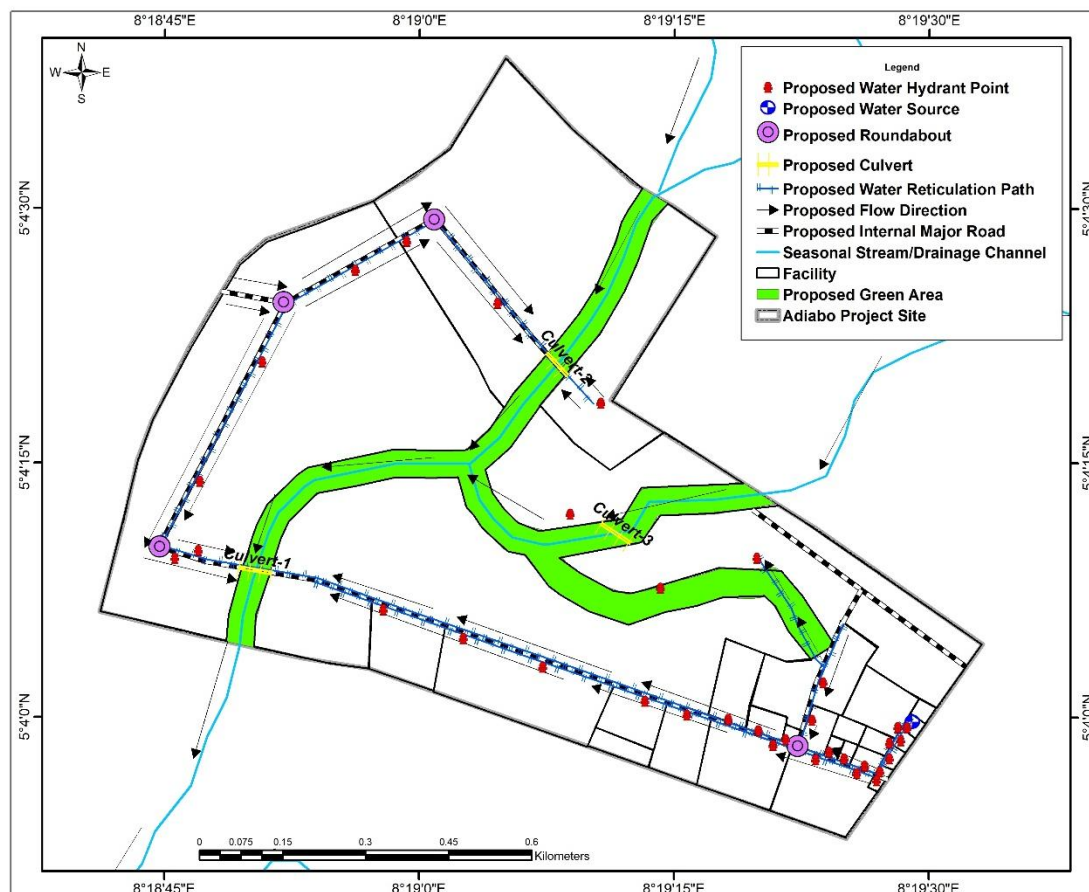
AIH site plan showing proposed water, waste water reticulation layout with hydrant stations
